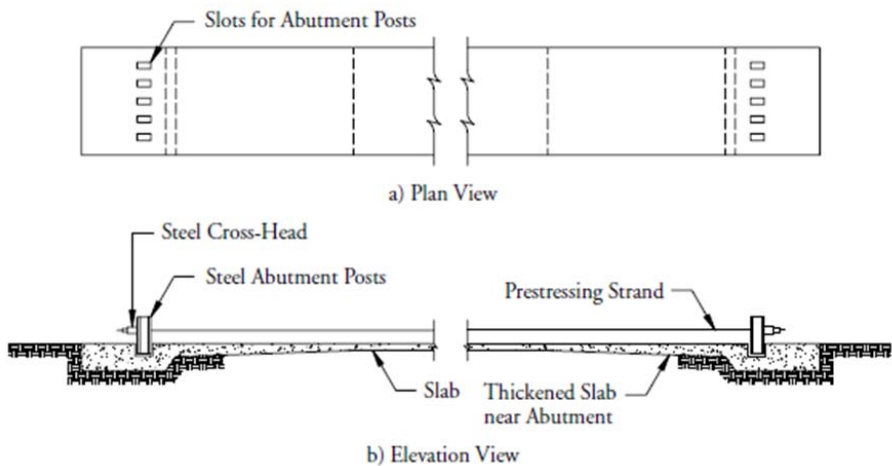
Prestressing bed with fixed abutments (PCI Bridge manual)
